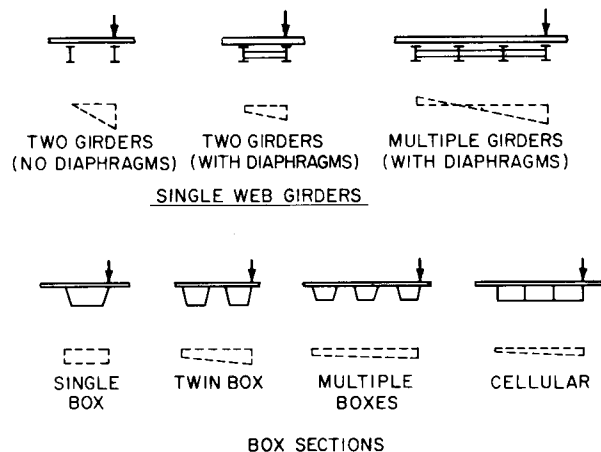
Comparison of lateral load distribution for single-web girders and box girders.
